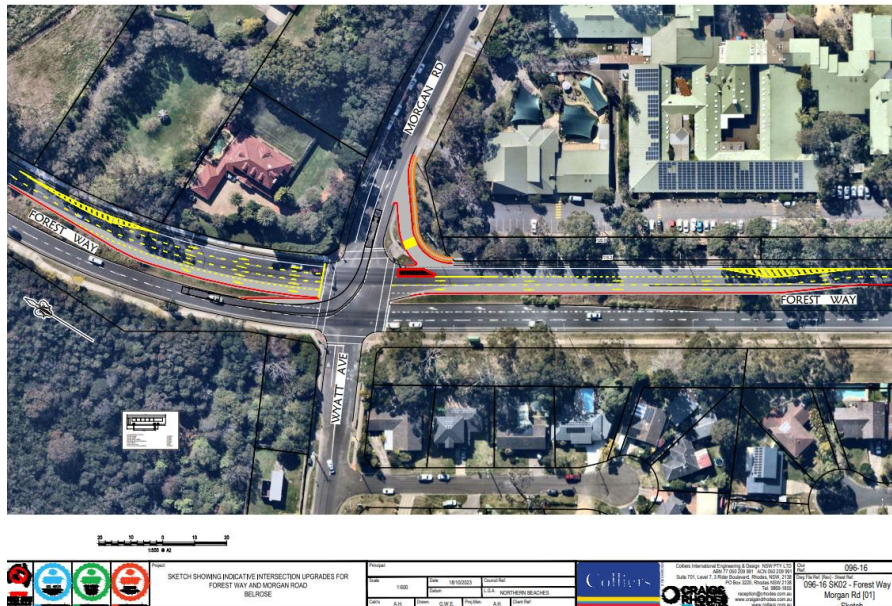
Proposed upgrade to Morgan Road / Forest Way intersection (Colliers, August 2024)
